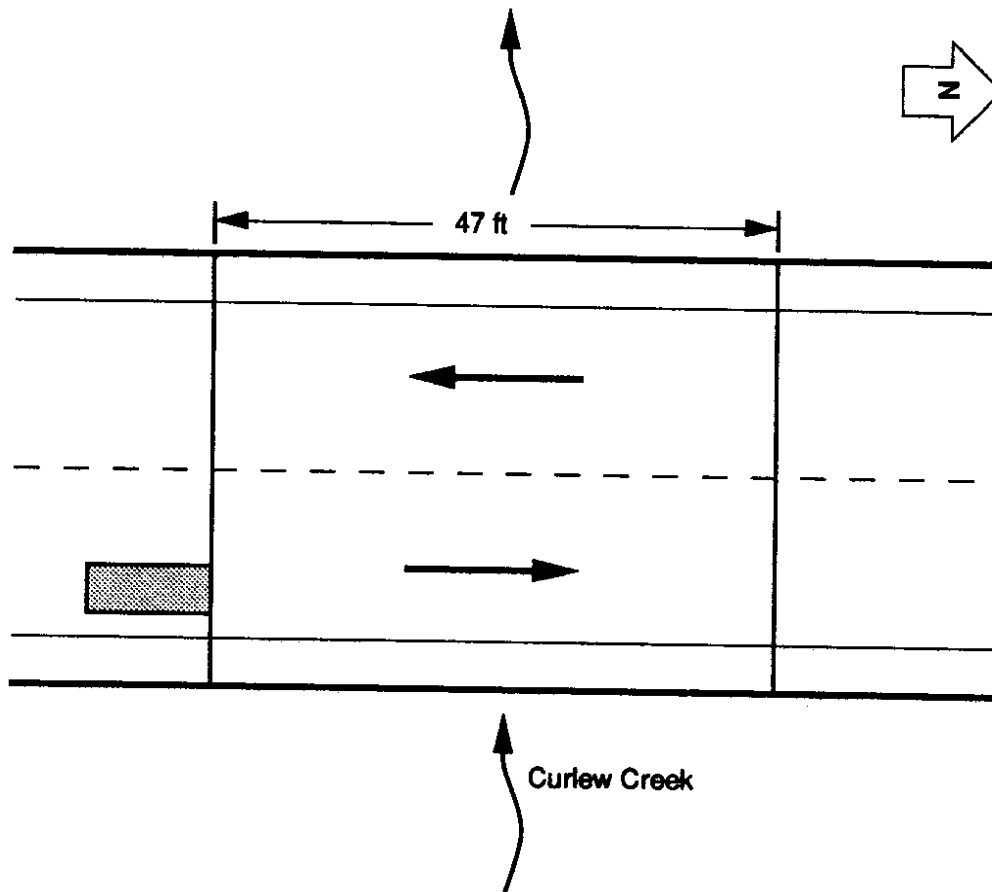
Location of Test Section in Northbound Lane of Curlew Creek Bridge (M.P. 140)
